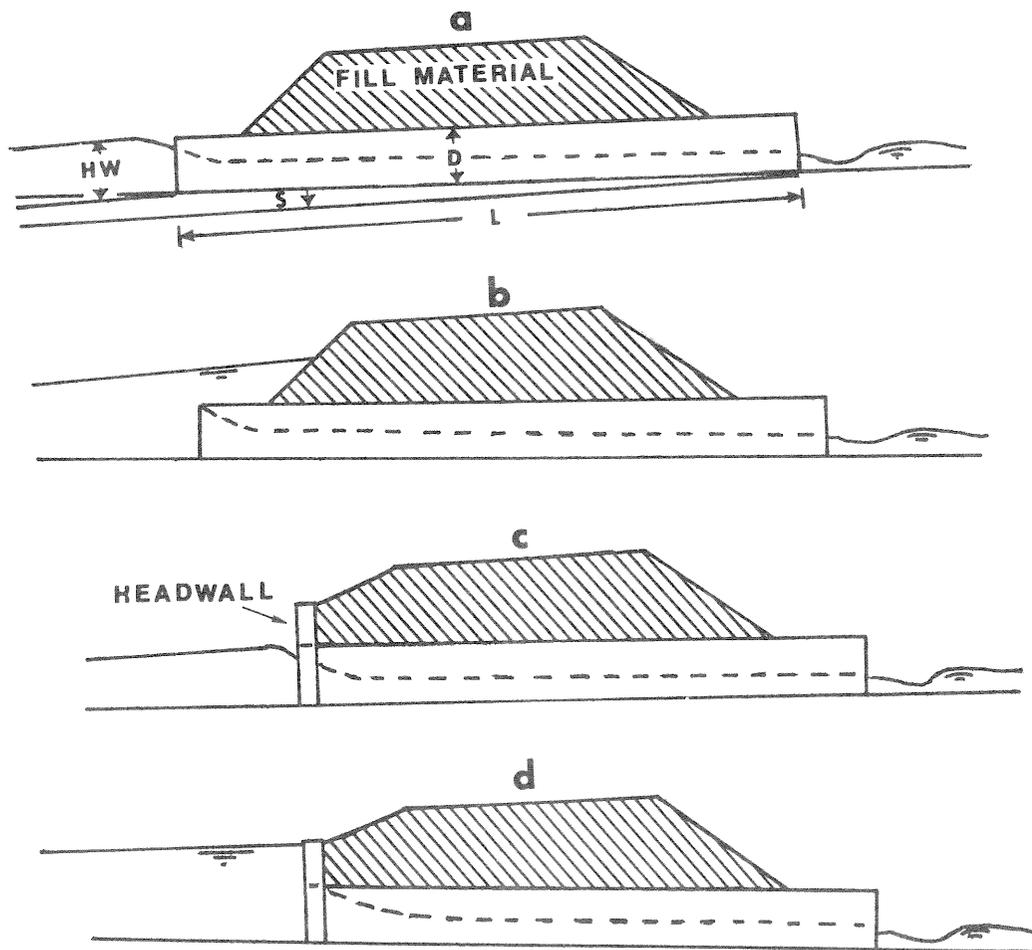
Inlet control for two types of culverts and two depths of headwater. Schematics a and b illustrate culverts which project into the inlet basin. In a, headwater depth (HW) is equal to the culvert diameter (D) or rise of pipe-arch culverts; in b, headwater depth is greater than culvert diameter. The two examples of headwater depth are shown for culverts with headwalls in c and d. Other dimensions are culvert length (L) and slope (S).
